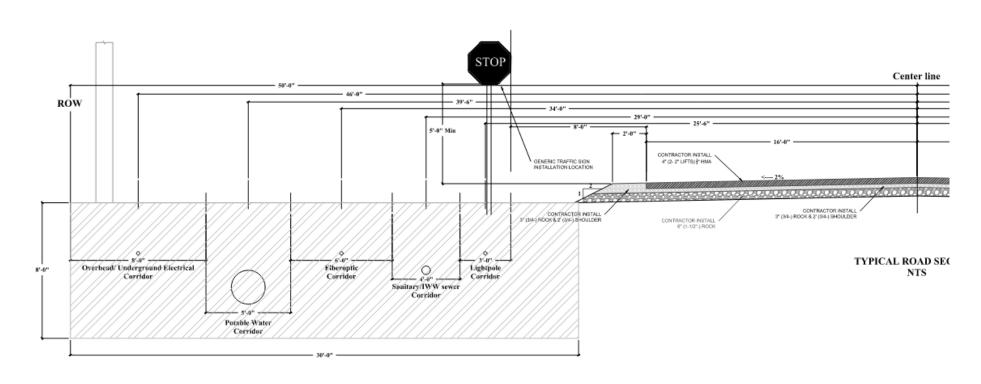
Typical Road Section for Boardman Airport Lane (Half Street ROW); Source: Port of Morrow Airport Road Infrastructure Plans
